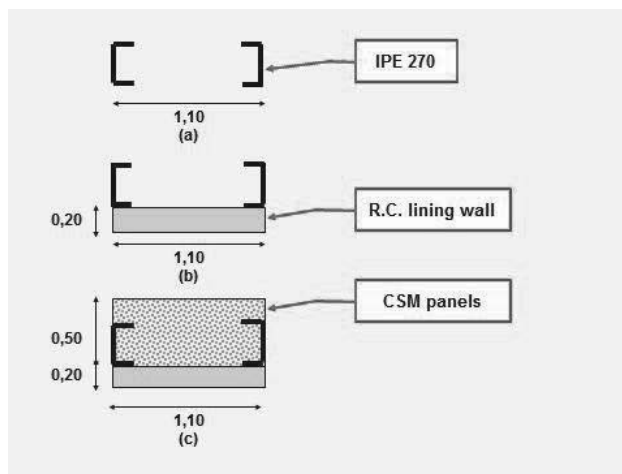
Configurations adopted in the modeling: a) two half vertical IPE270 spaced in 1.1 m, b) two half vertical IPE270 spaced in 1.1 m plus lining wall and c) two half vertical IPE270 spaced in 1.1 m plus lining wall and CSM panels.
